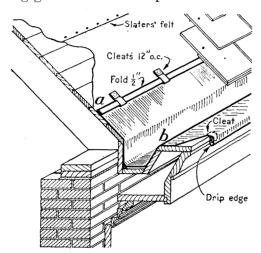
Built-in gutter. Note that flashing should be at least 2 inches higher at a than at θ .
